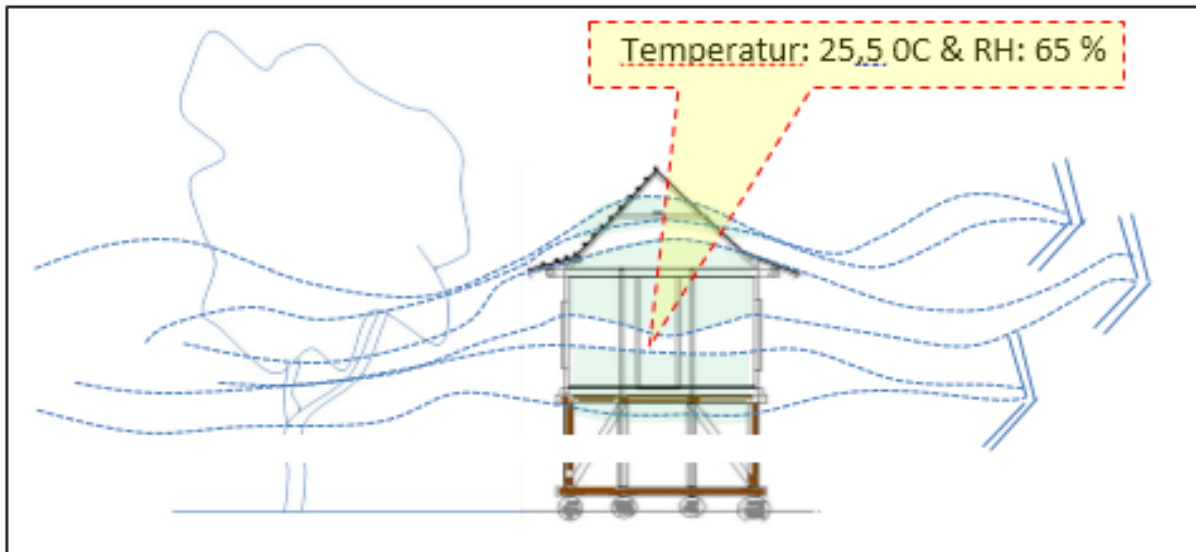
Pattern of Air Circulation and Thermal Comfort Condition at Traditional House in Kampung Jawa Tondano
